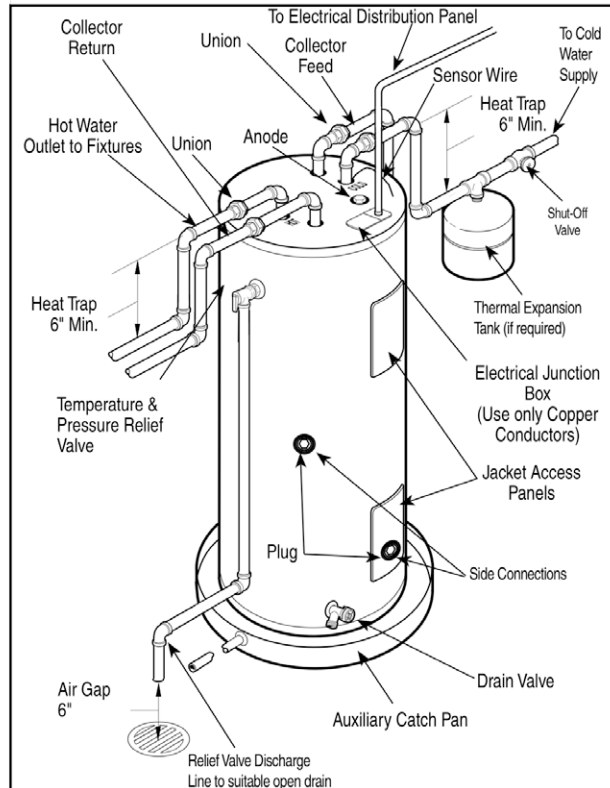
Typical Installation for Top Connections - Side collector feed openings must be plugged with 3/4" Plugs.
